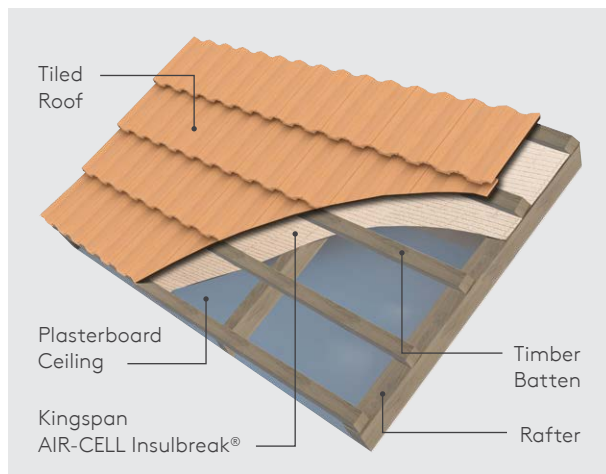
Kingspan AIR-CELL Insulbreak® 55 in a timber framed tiled roof with a raked ceiling.
